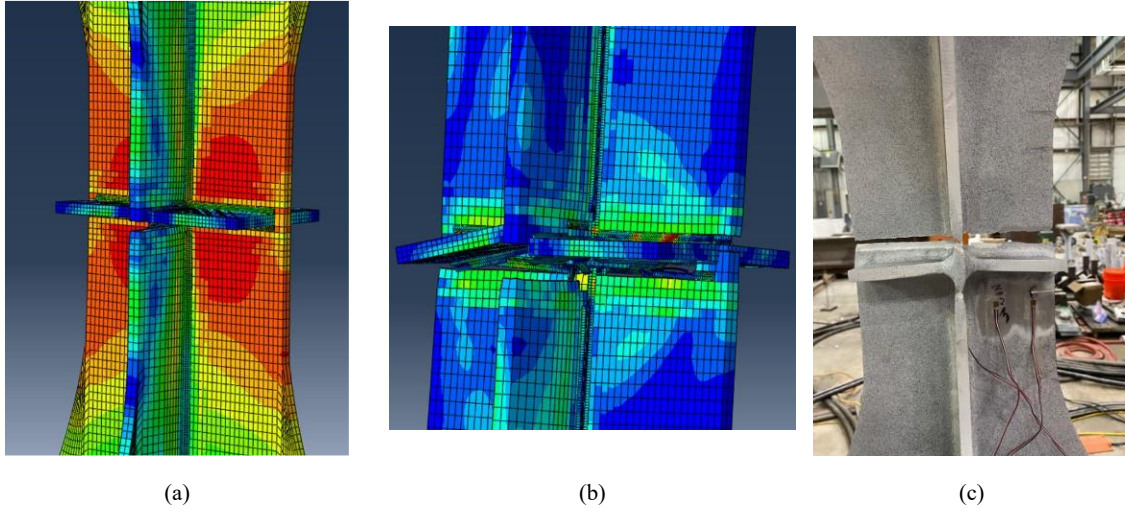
Behavior of the FE model of LT specimens (a) failure of the stiffener prior to the overall failure, (b) overall failure, and (c) failure of specimen T3 in the same manner (note the post failure orientation of the transverse stiffener that was captured by the FE model).
